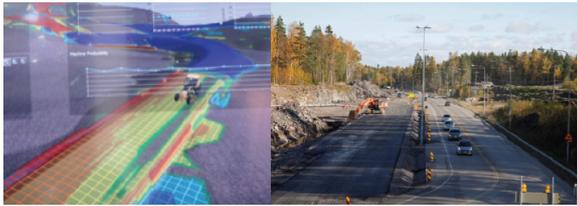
Topcon SiteLink3D system (left picture) for the control of road construction site (right picture).
